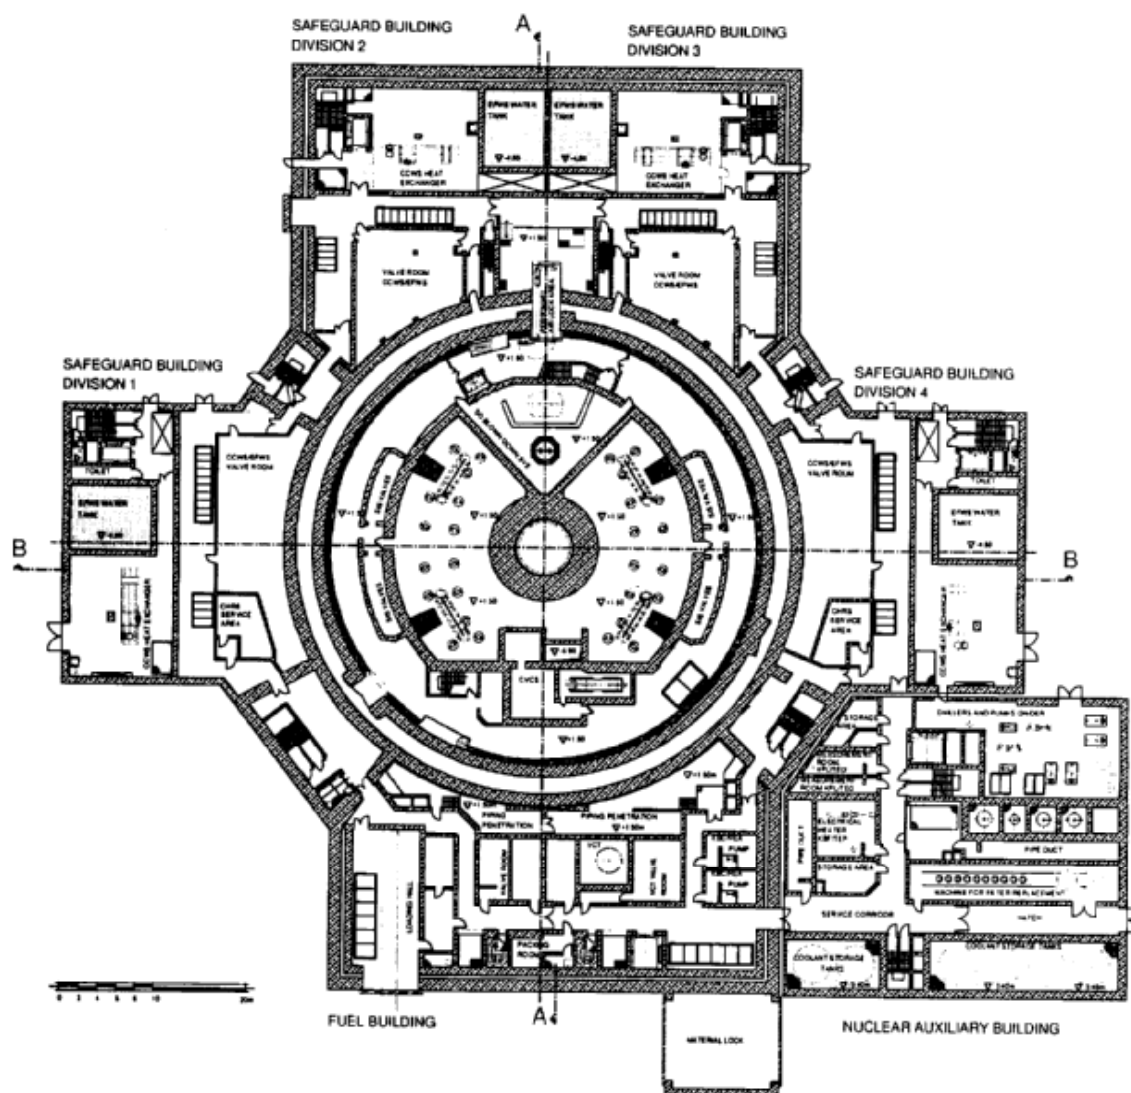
EPR - Building arrangement, plan view  $\pm 0,00$ .
